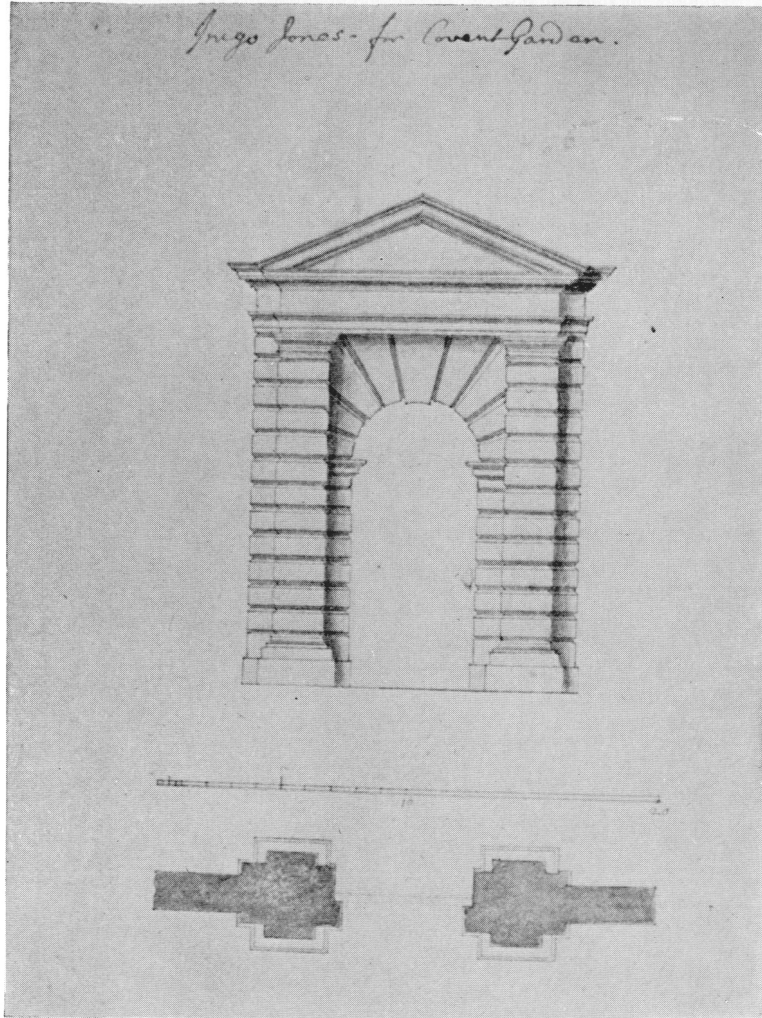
Plan and elevation of one of the gateways flanking St Paul's, Covent Garden [110]
